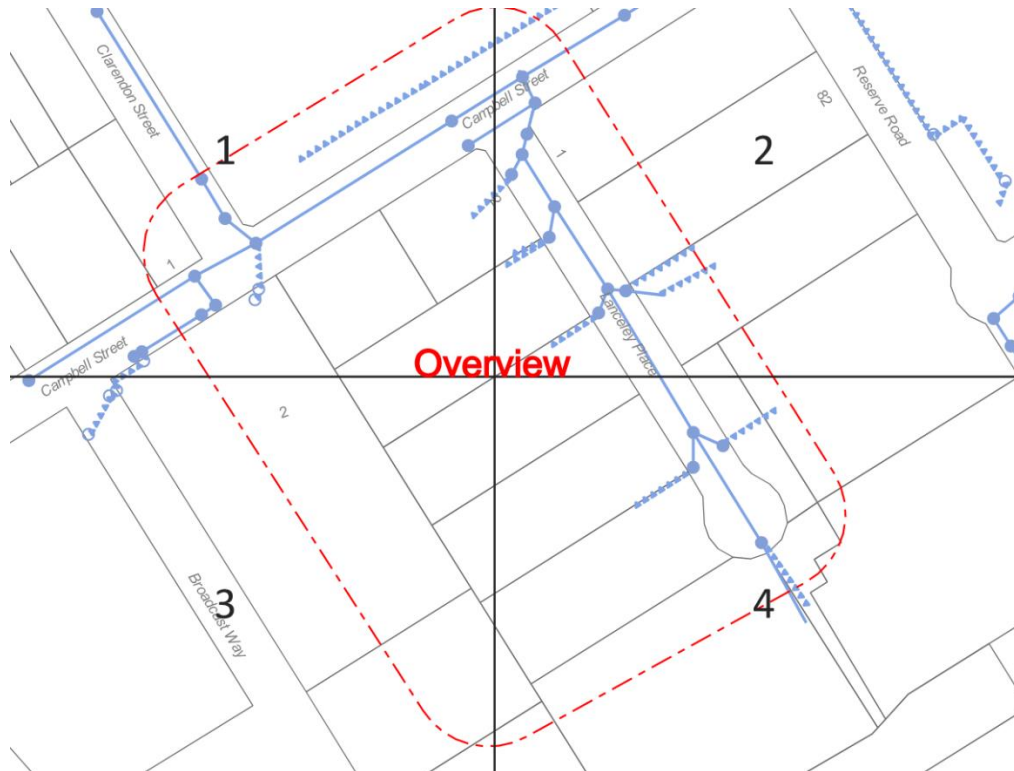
Existing Stormwater Infrastructure (Source: BYDA)
